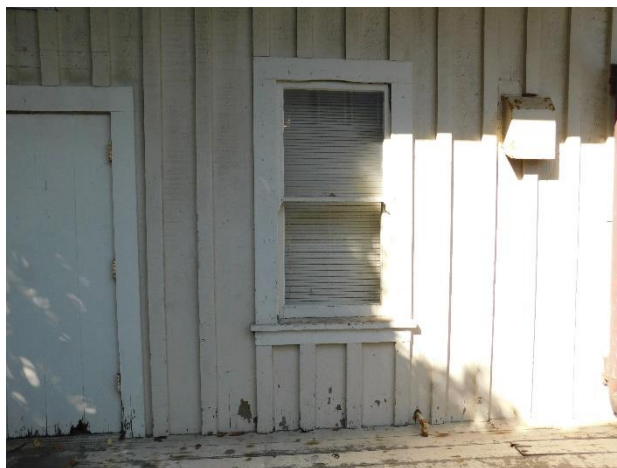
1/1 double-hung wood window found at ancillary spaces.
